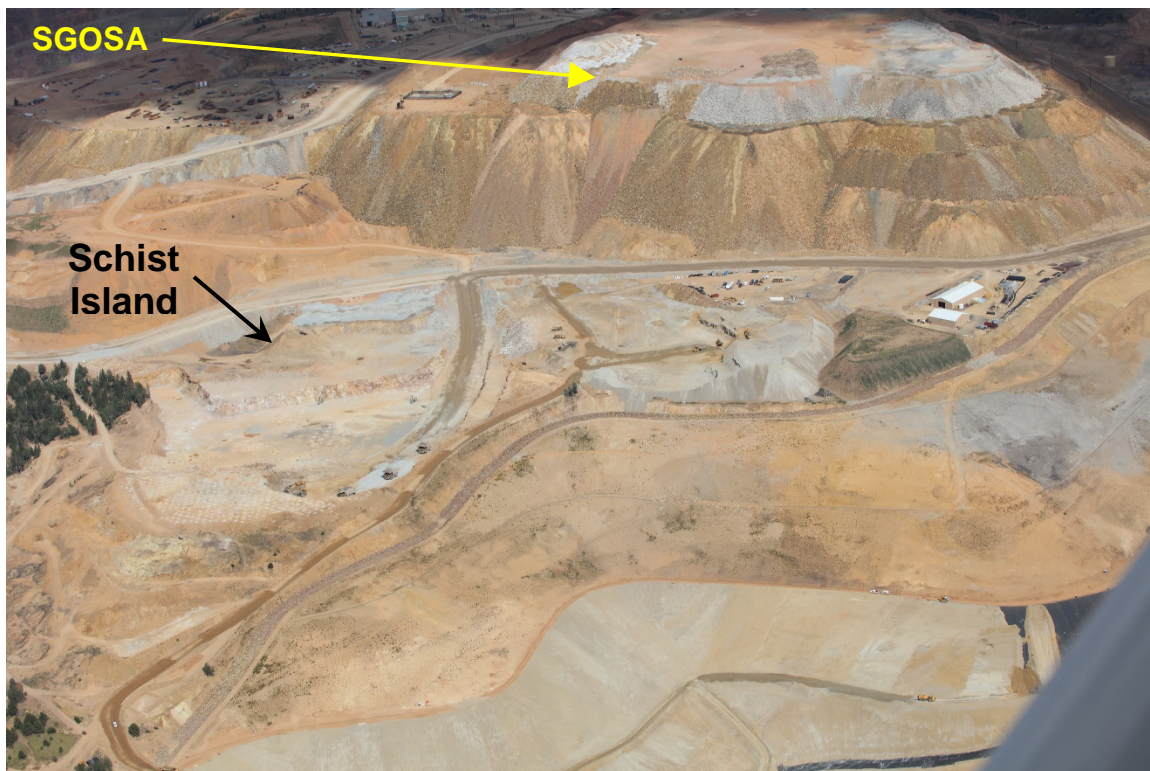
North Cresson pit – Schist Island Pit (Looking east).
